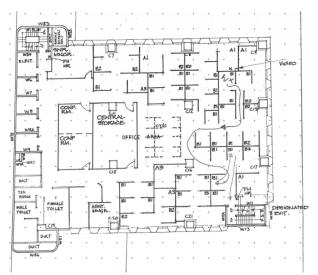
Floor plan of Level 18, Building 8. (Marked up with an occupant's movement path from original project).
